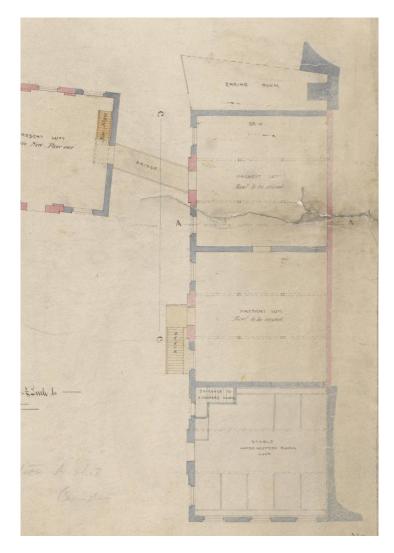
1881 plan of the Tack Room showing the south end as an 'engine room'.
